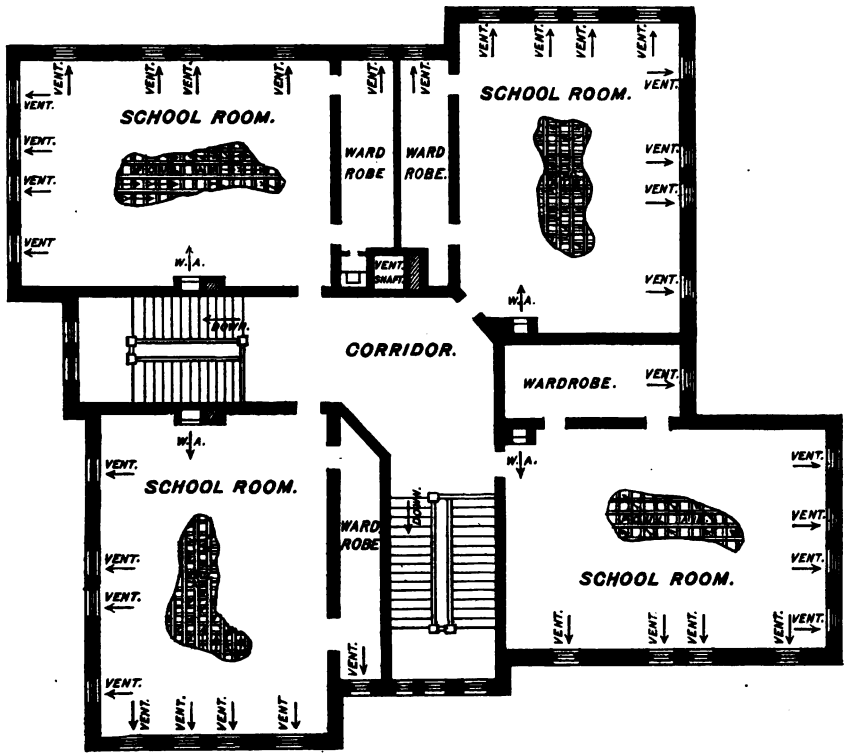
Plan of second floor, South Street school building, Toledo, Ohio.
